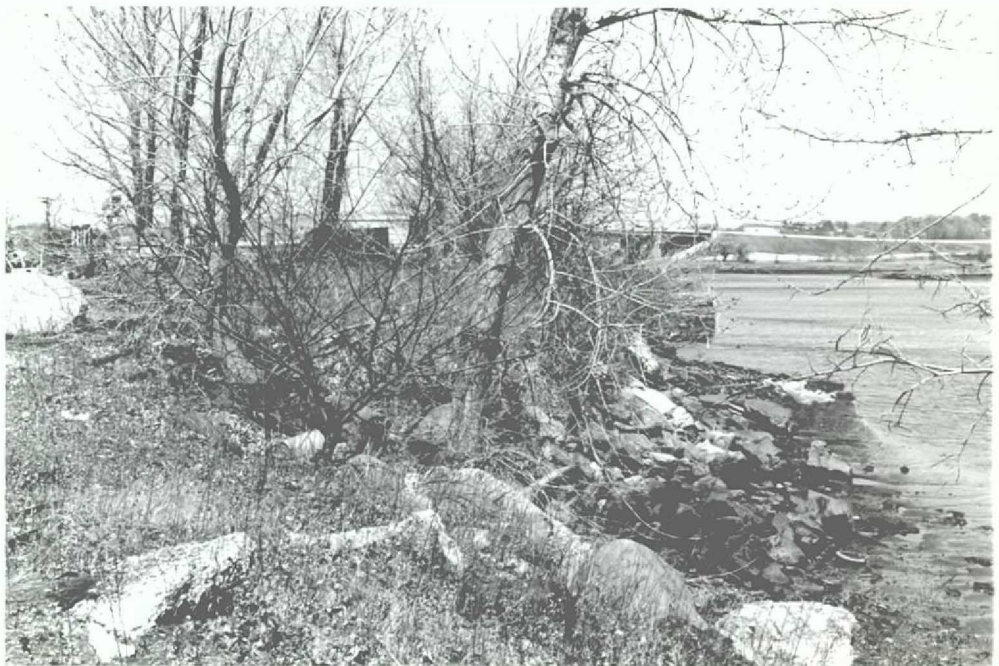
NYCDEP Conner Street Pump Station, DOT Site 1
